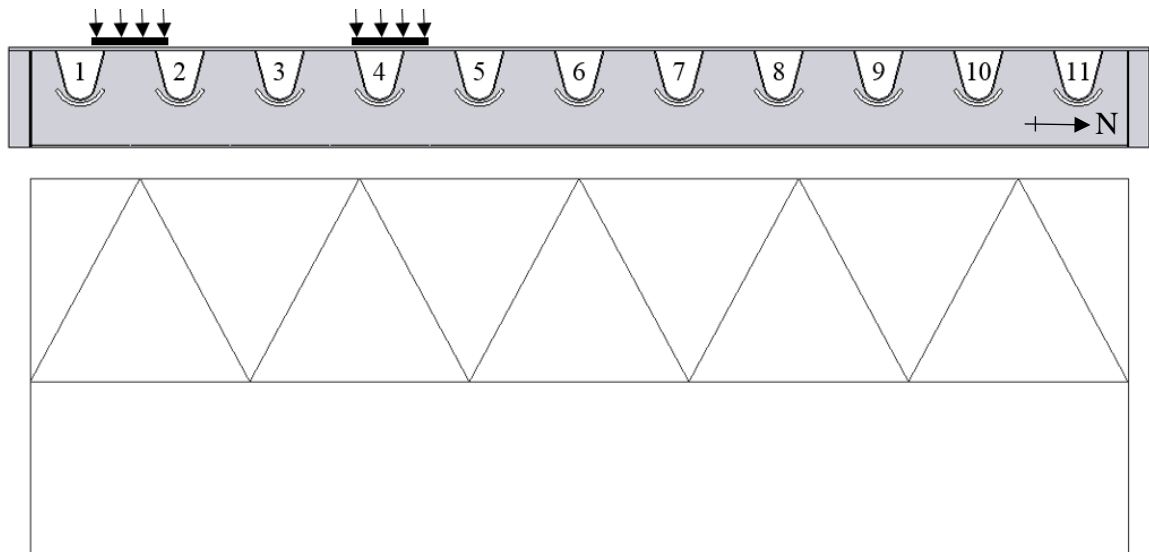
Illustration. Transverse load position of full tandem for truss-restrained floor beam under in-plane loading.
